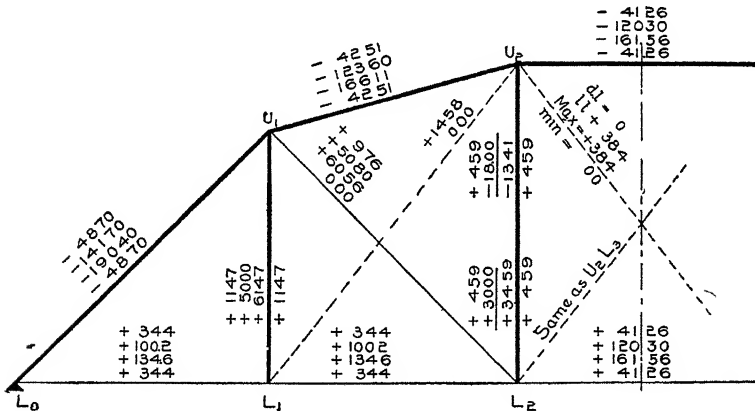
Stress Diagram of Half-Span of Parabolic Truss of Fig 54
